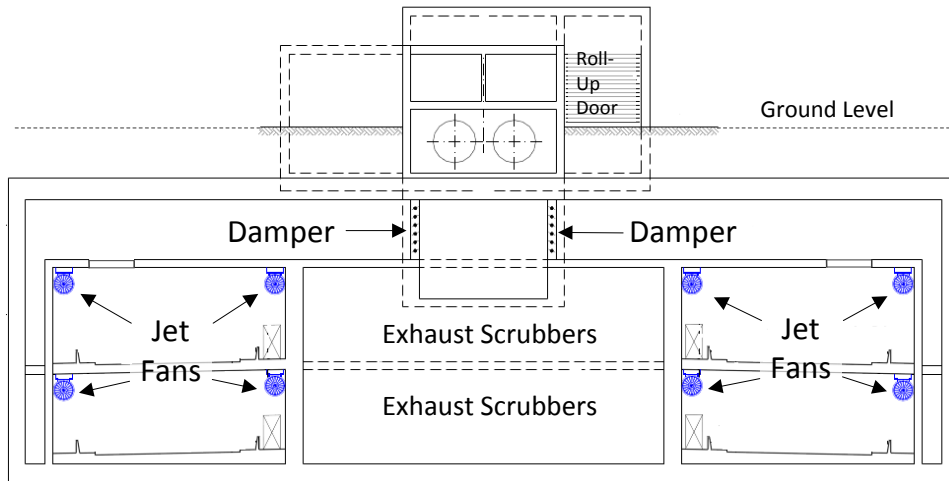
Cross Section of Cut and Cover of the North Portal OMC Building
